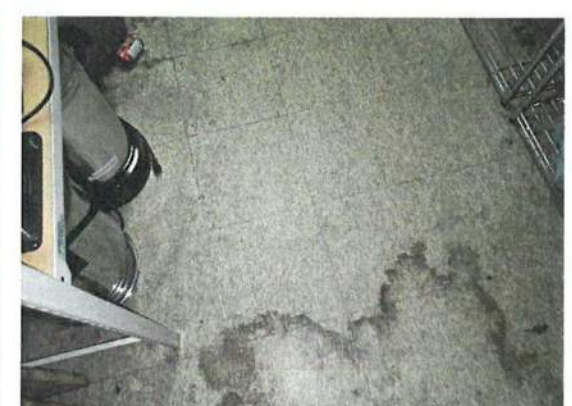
Vinyl Floor Tile – Kitchen Storage (ND)
